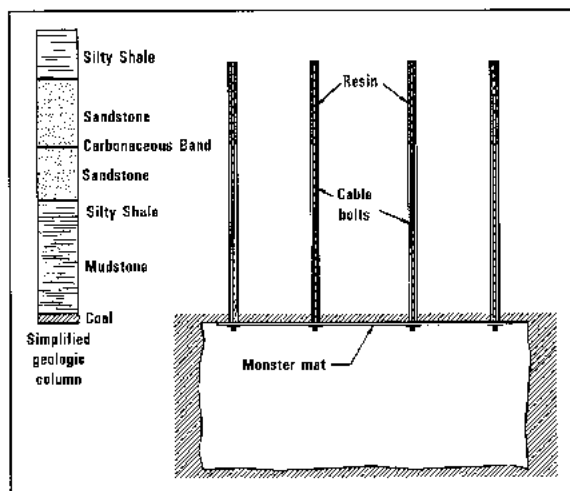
Typical coal mine intersection column used for designing cable bolt length and resin-grout length.
